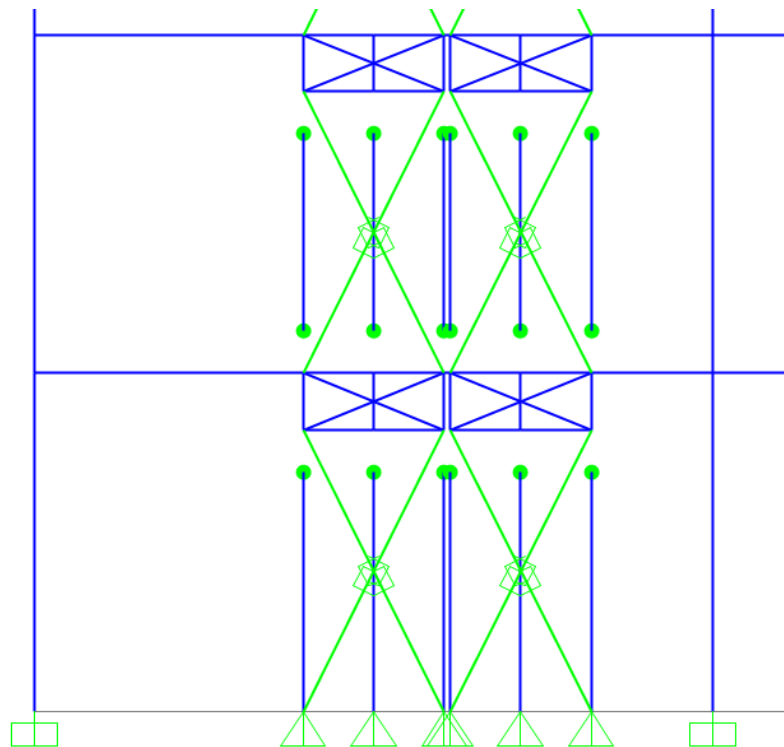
Representation of the modeling of a double-module light timber shear wall, in which it is possible to notice the hinges at the base of the wood columns, the end-releases at the ends of each stud, the use of a connection between the existing frame's beam and the shear wall (to fill the height gap), and the link elements connected to the corners of the shear walls.
